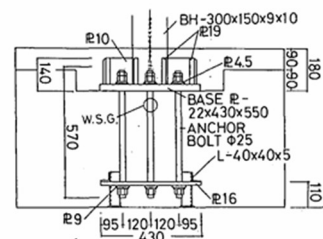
(b) Detail of anchorage of C-Type specimen (unit mm)
